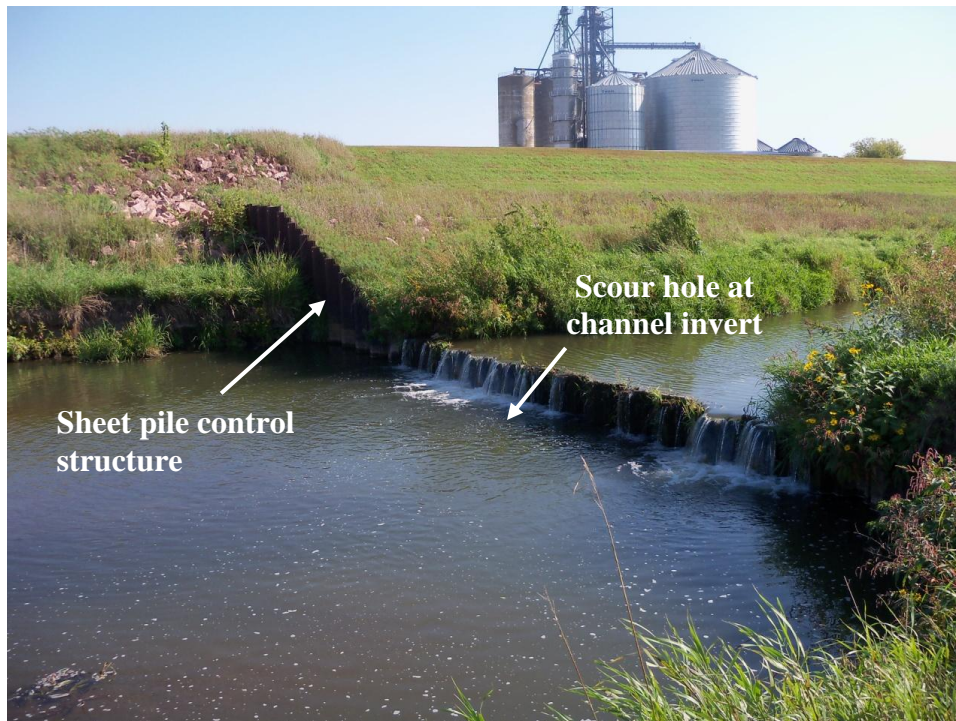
The sheet pile control structure at Dry Creek. Directly downstream of the control structure is the four foot deep scour in channel invert.
